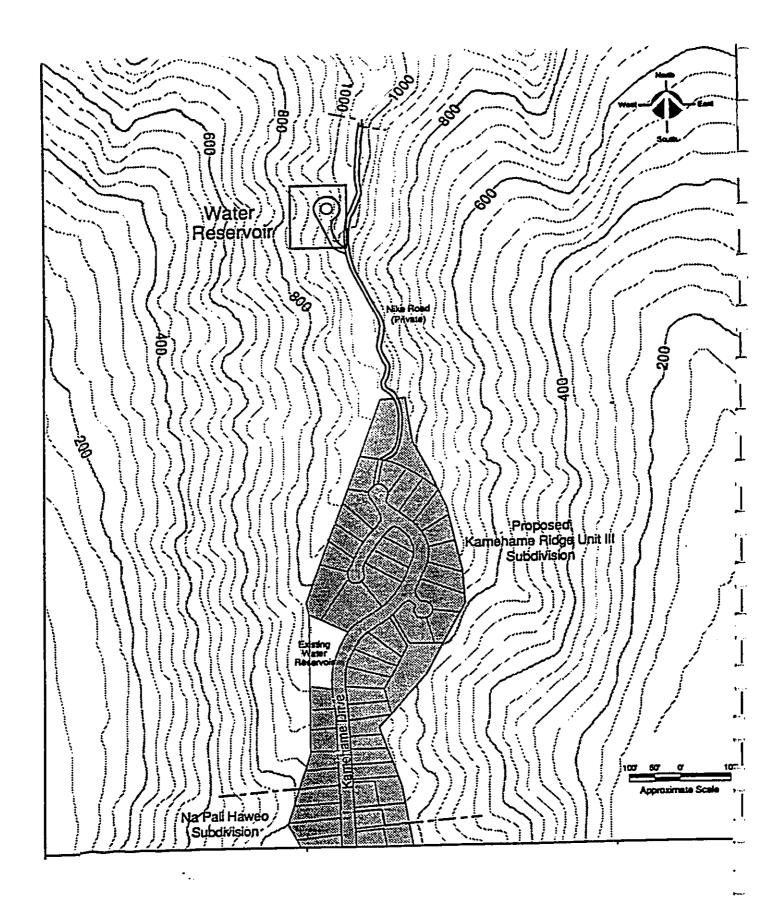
Site Plan for Proposed Reservoir and Access Road From Pacific Planning and Engineering
